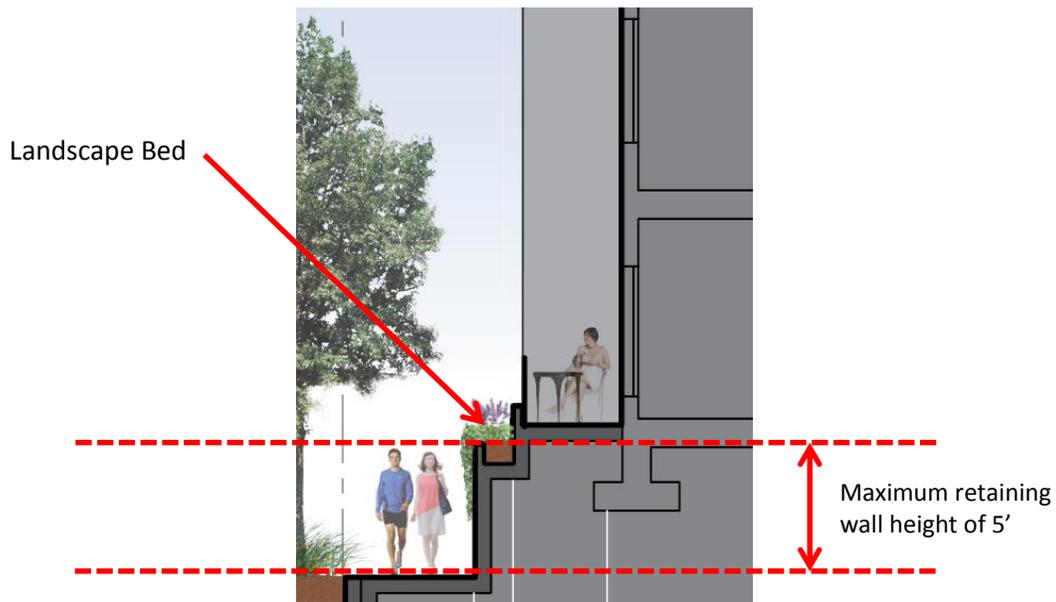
Sidewalk-adjacent retaining wall requirements.
